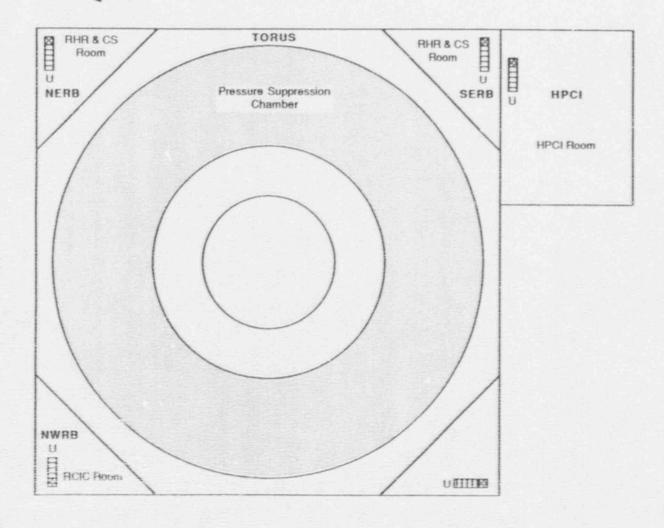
Hatch Unit 2 Reactor Building Arrangement - Elevation 87 ft.
